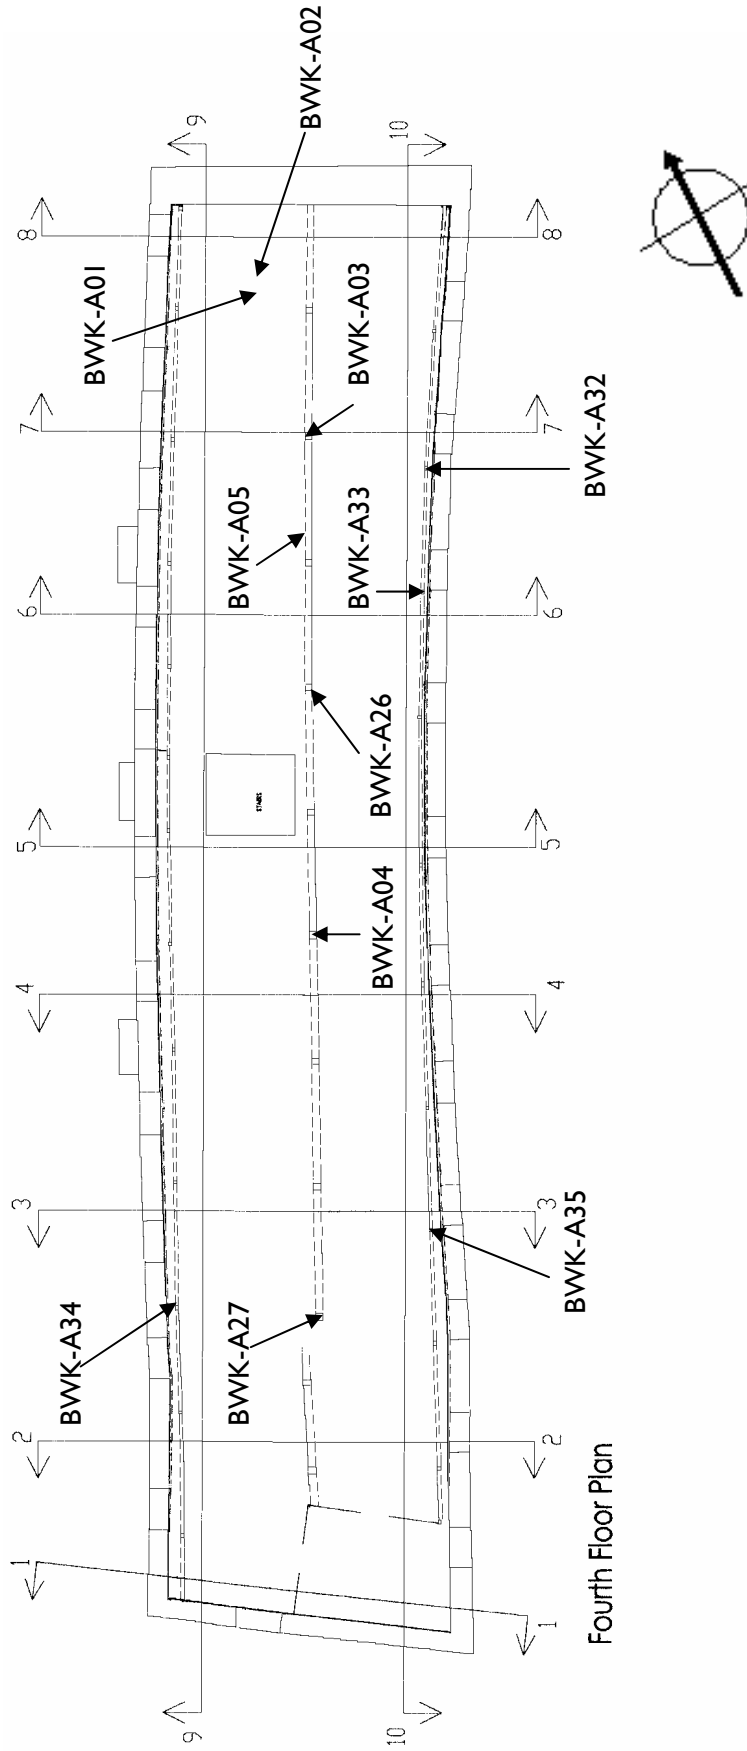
Fourth-floor plan showing the location of samples BWK-A01-05, BWK-A26-7, and BWK-A32-5 (Bain, Swan Architects)
